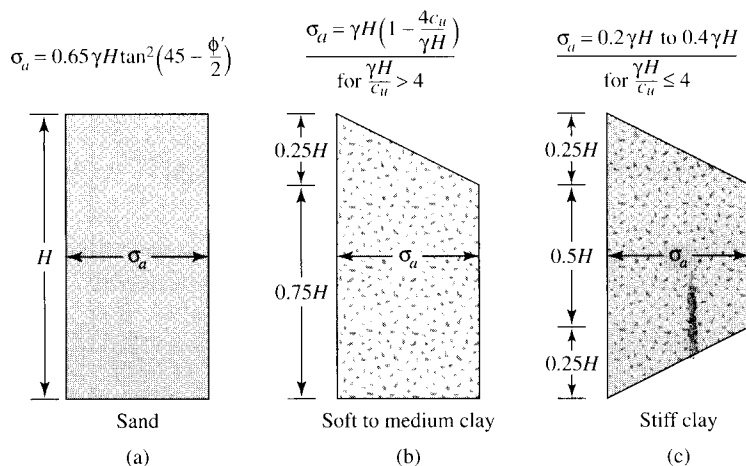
Peck's pressure diagrams for design of bracing systems
